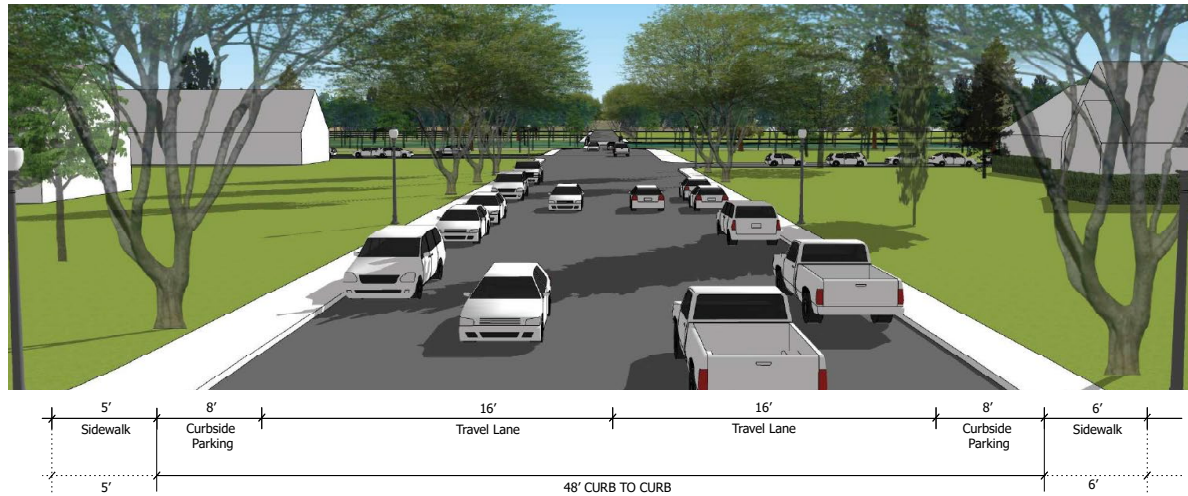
Harney - Streetscape Concept with Wider Sidewalks looking East towards the Creek
